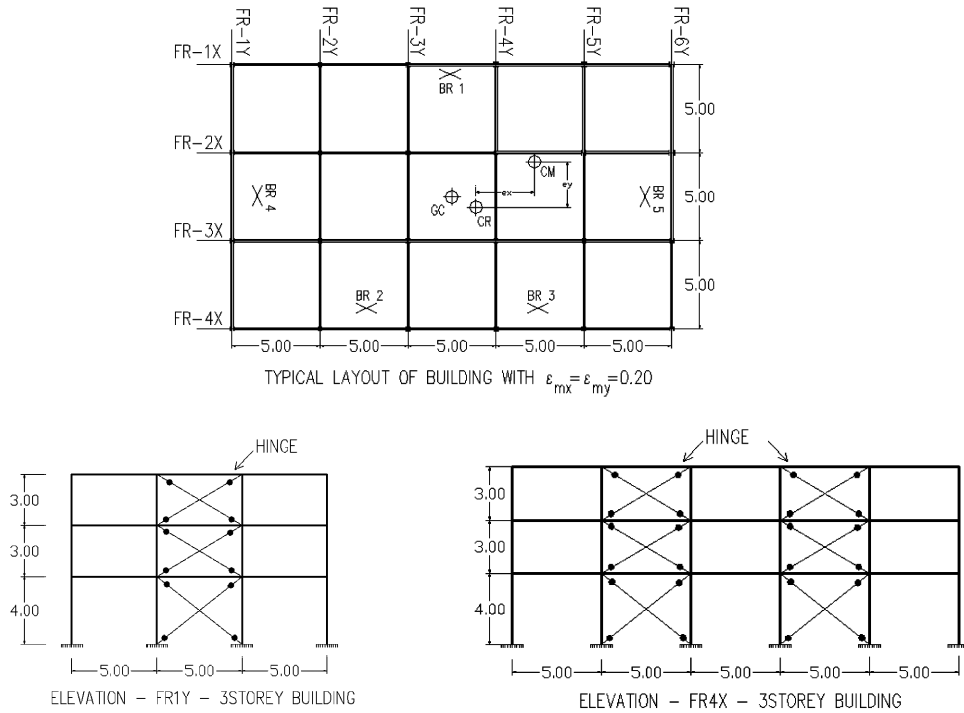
Layout of 1, 3 and 5-storey buildings and  $x, y$  elevations of the 3-storey buildings
